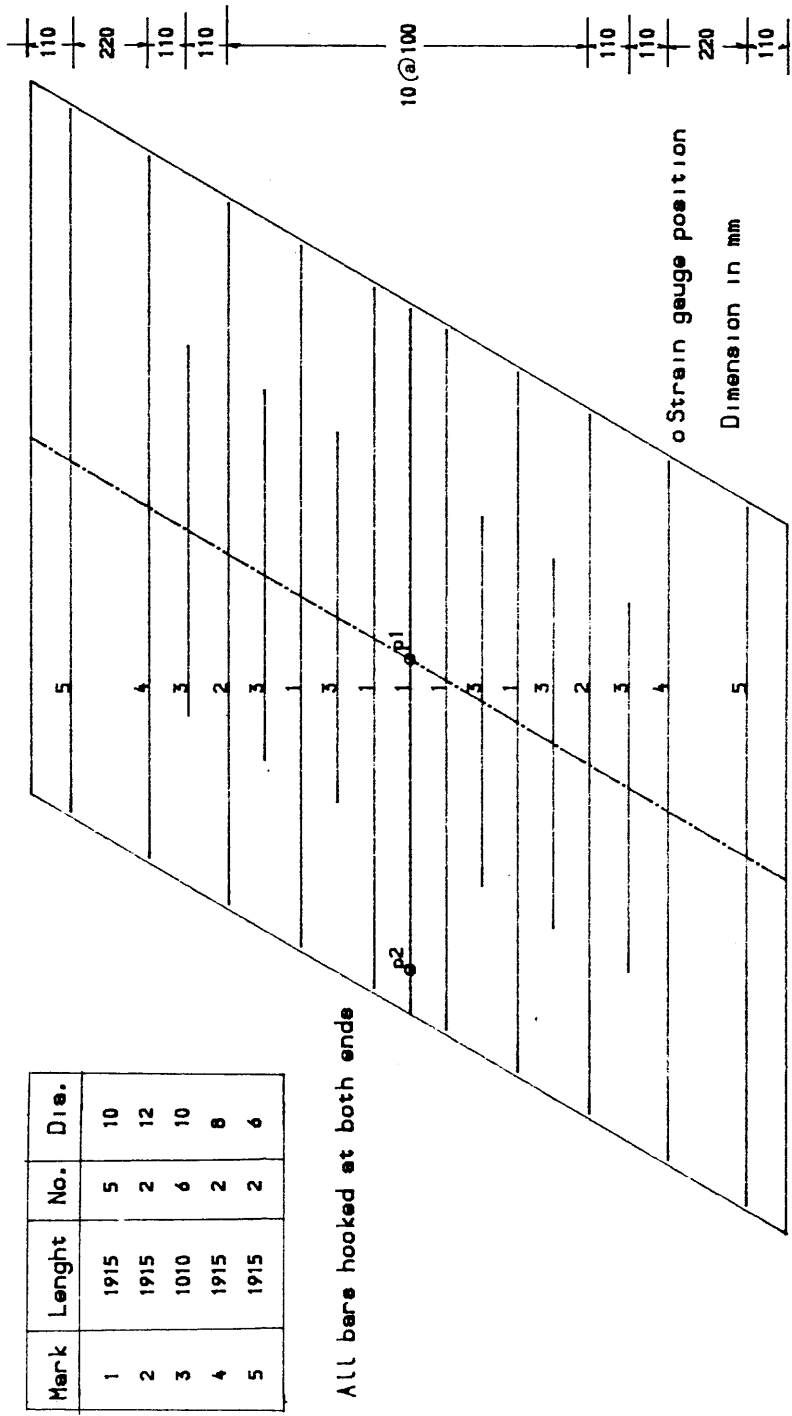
MODEL SKEW SLAB NO. (2) Details of bottom transverse steel parallel to the supported edge and position of strain gauges
